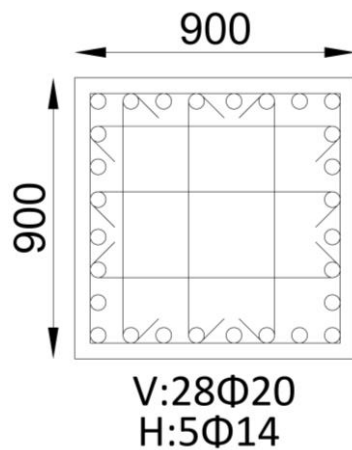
Column Longitudinal Reinforcement for Stories Between 11 - 20
